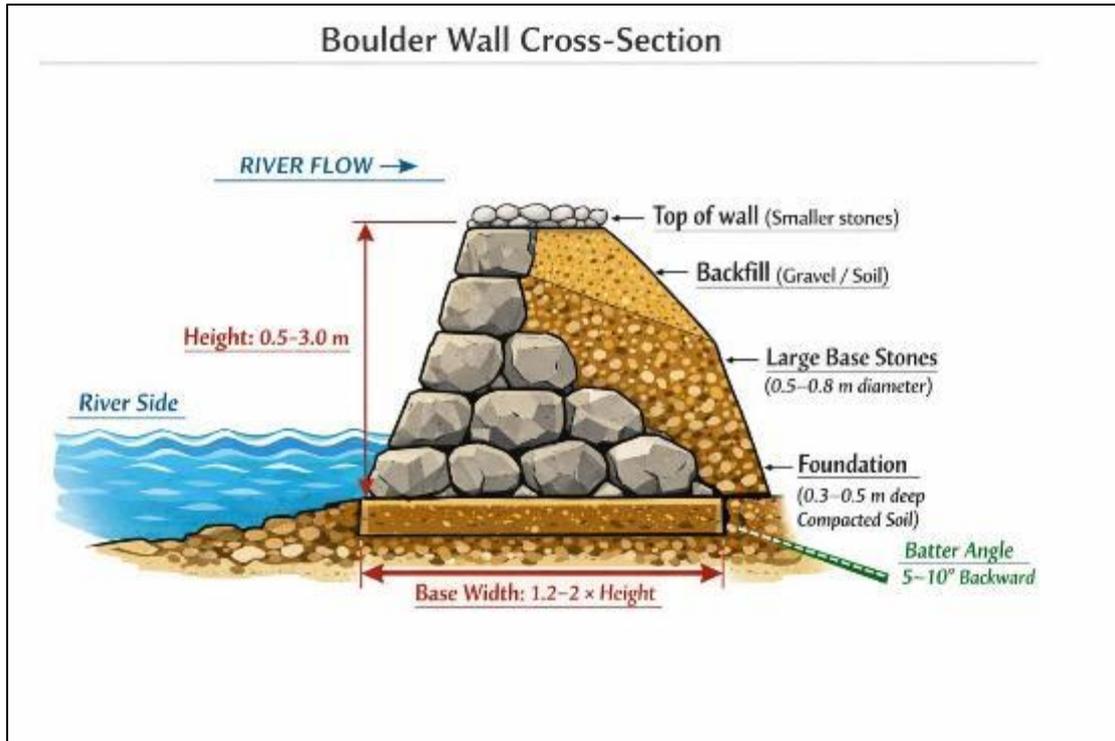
Cross-sectional design of a boulder (gravity) wall for riverbank protection, showing the arrangement of smaller top stones, gravel/soil backfill, large base stones, compacted foundation, batter angle (5–10°), wall height (0.5–3.0 m), and base width (1.2–2 × height).
